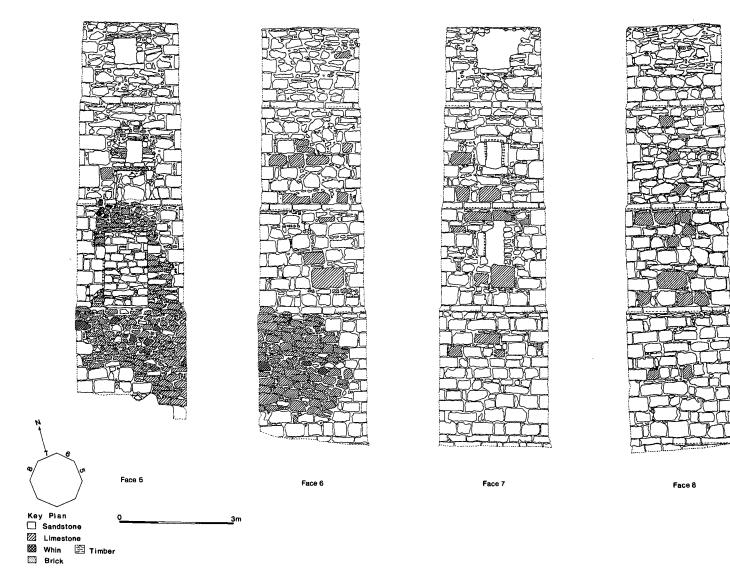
Berwick Bell Tower: elevations of faces 5-8.
